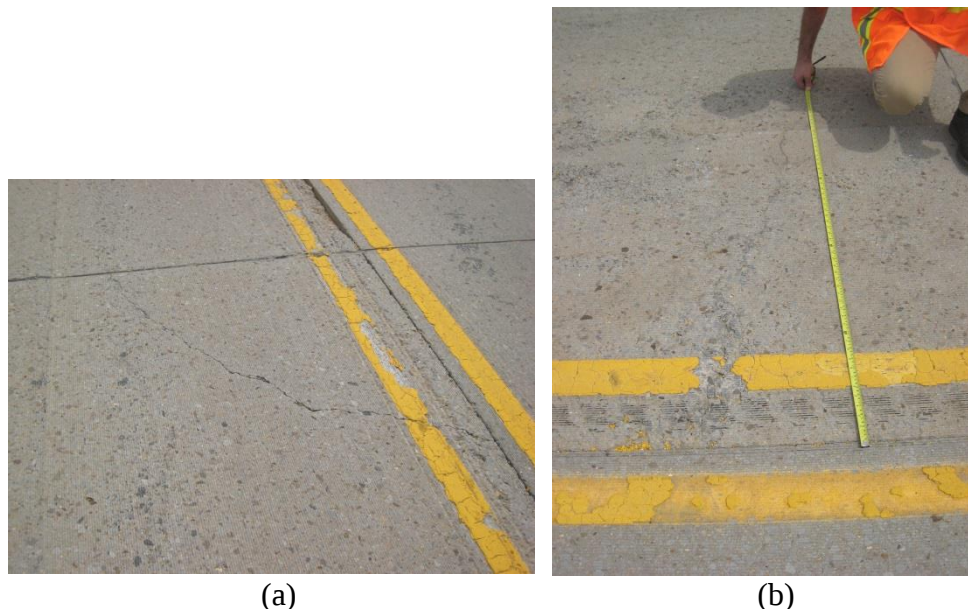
Corner break (a) and transverse crack (b) in Section 1.
